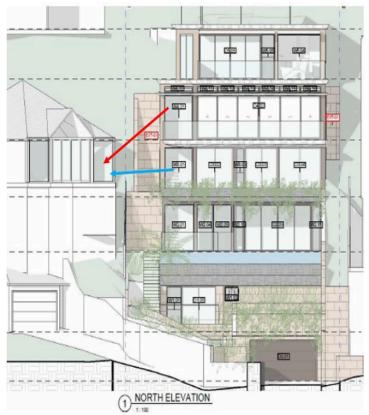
Composite elevations showing overlooking from the proposed level 1 and 2 balconies of 326 Whale Beach Road to the balcony of 374 Whale Bech Road
